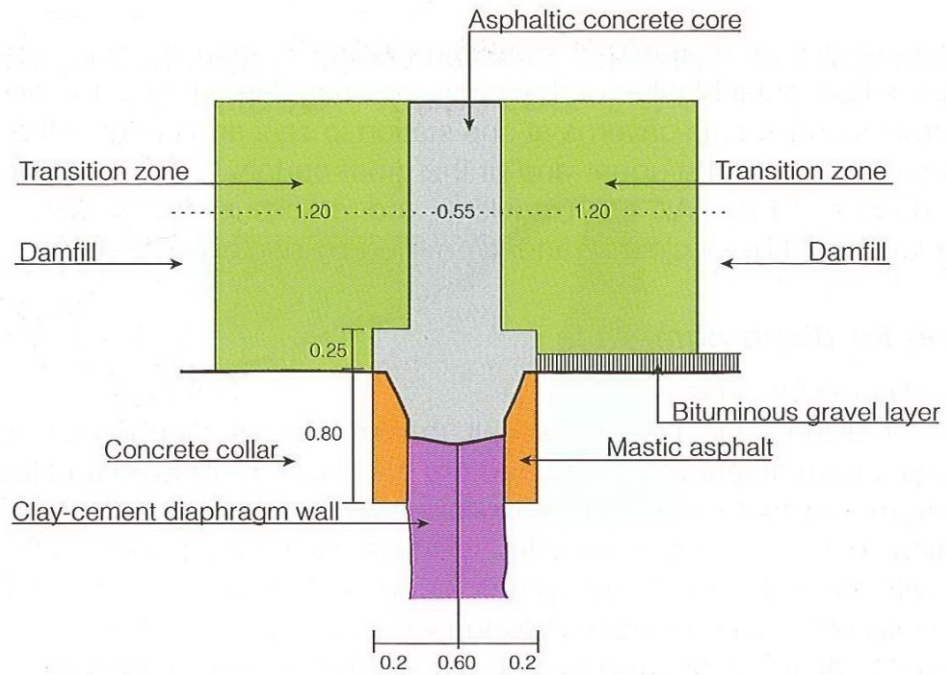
Detail Connection AC Core/Cut-off Wall
